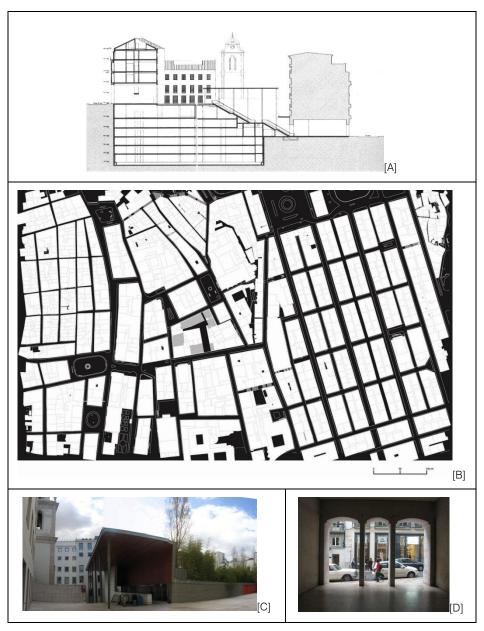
"Império" Block; [A] section between Carmo and Garret St(Source: Angelillo,1988); [B] location plan: public space(black),case-study (grey); [C]view of escalators; [D] access to Garret St
